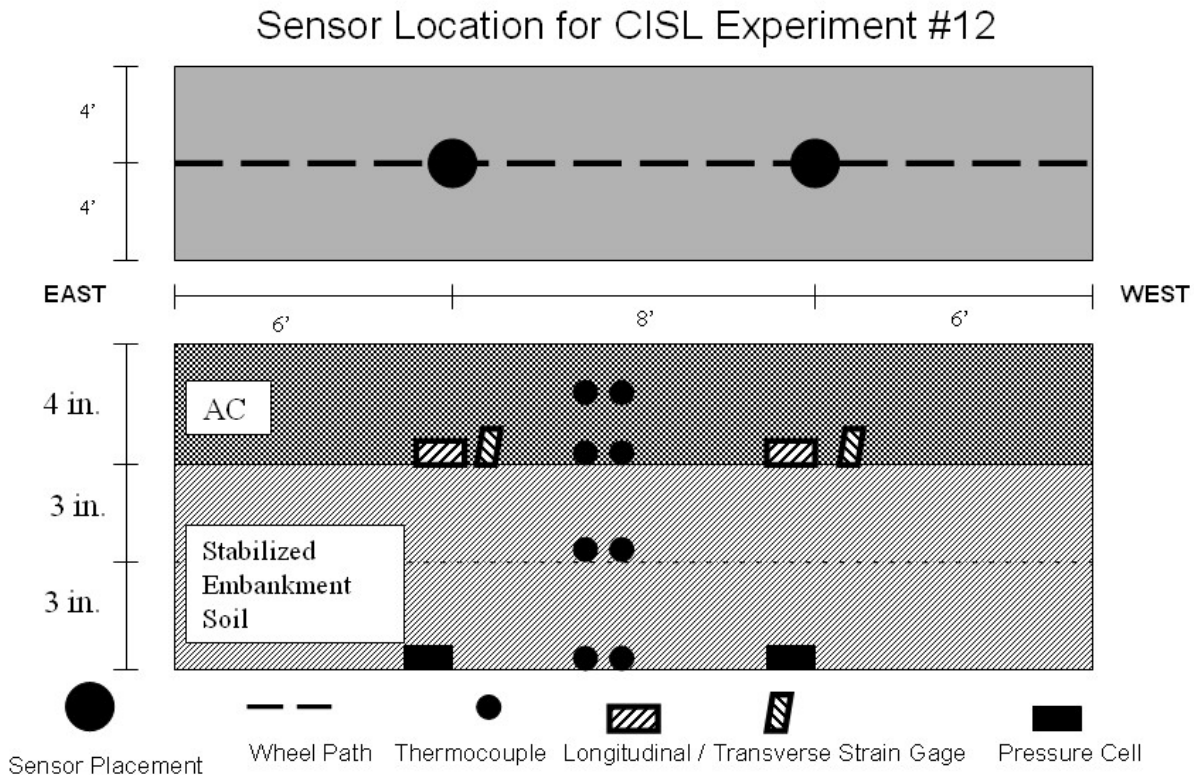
Location of Sensors Embedded in the Pavement Structure
